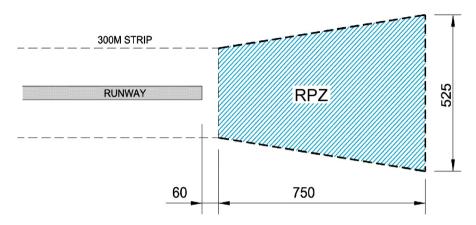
RUNWAY PROTECTION ZONE DIMENSIONS
